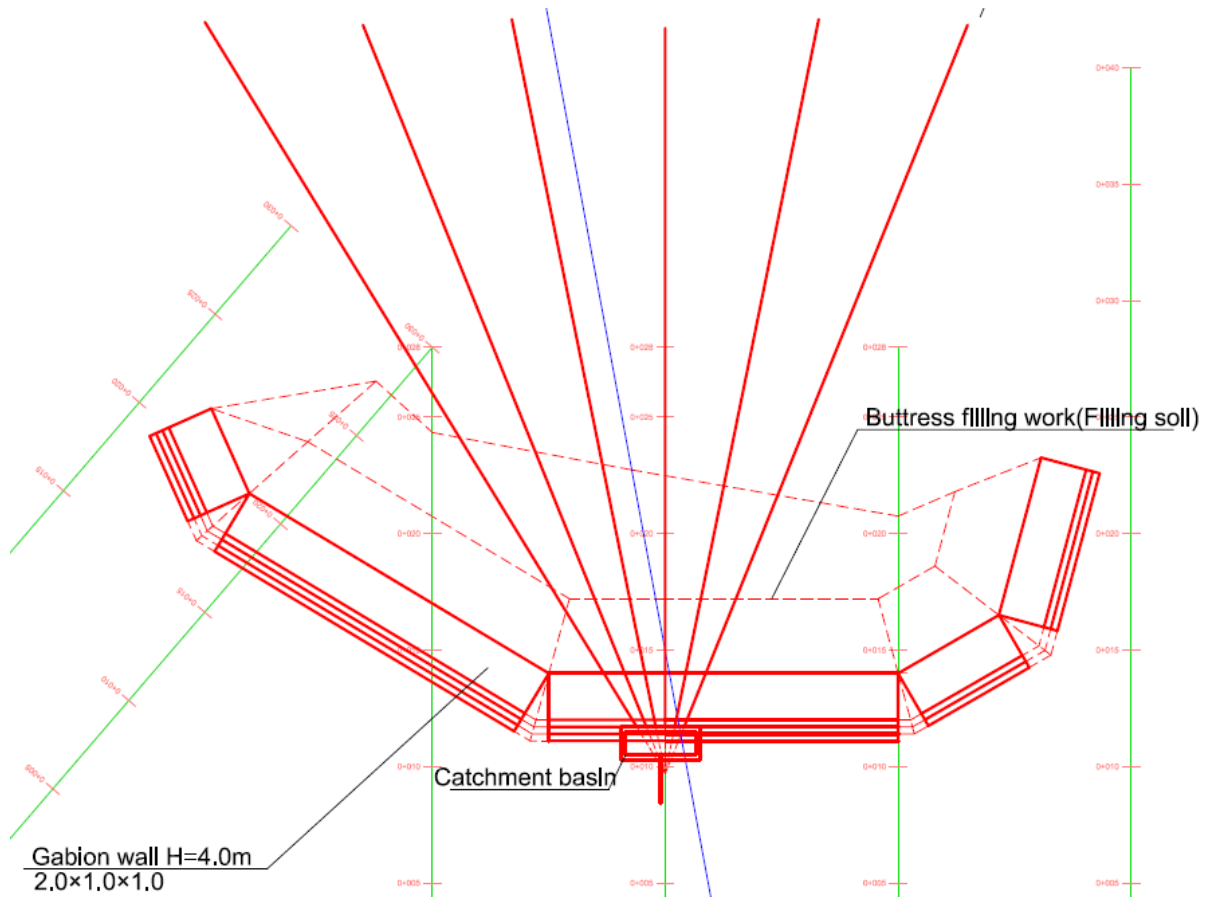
Structural drawing of Horizontal drainage boring (Nueva Santa Rosa)
